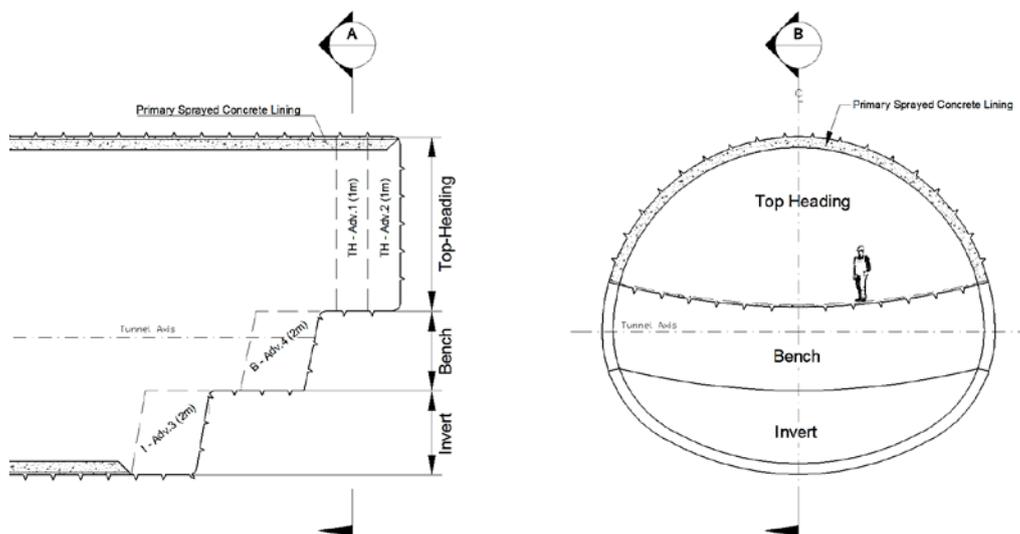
Excavation sequence top heading – bench – invert (DSP, 2016)
